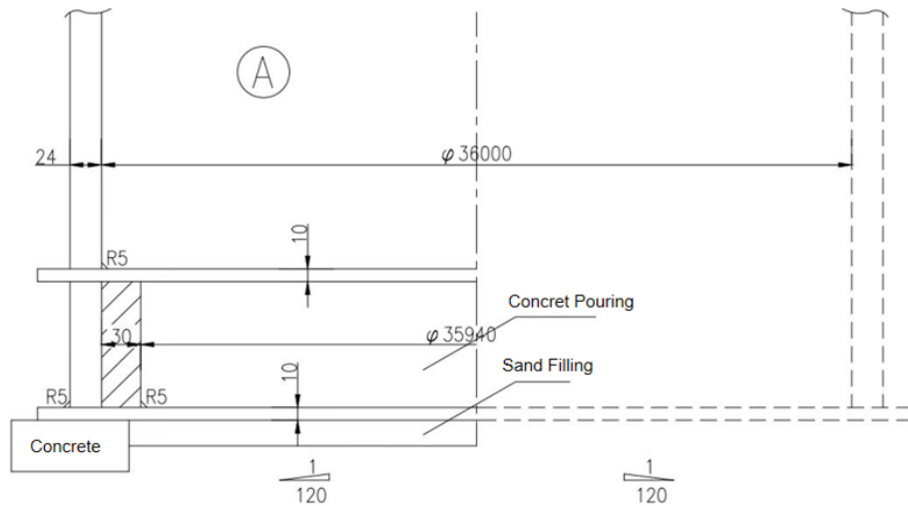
Finite element model of Structure A, featuring an external lower bottom plate with sand and a surrounding concrete ring beam; no elastic foundation is included (mm)
